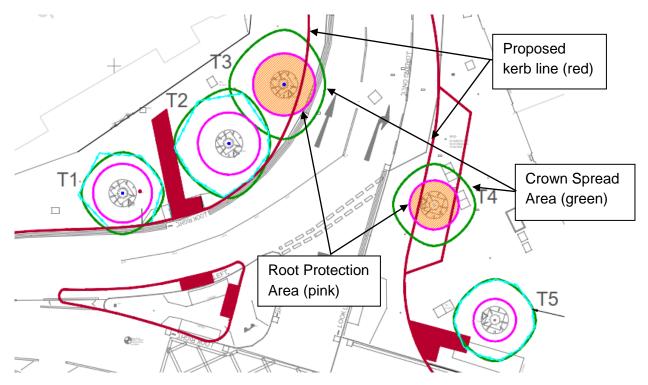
Extract from AIA showing Proposed Kerbing and Root Protection Areas
